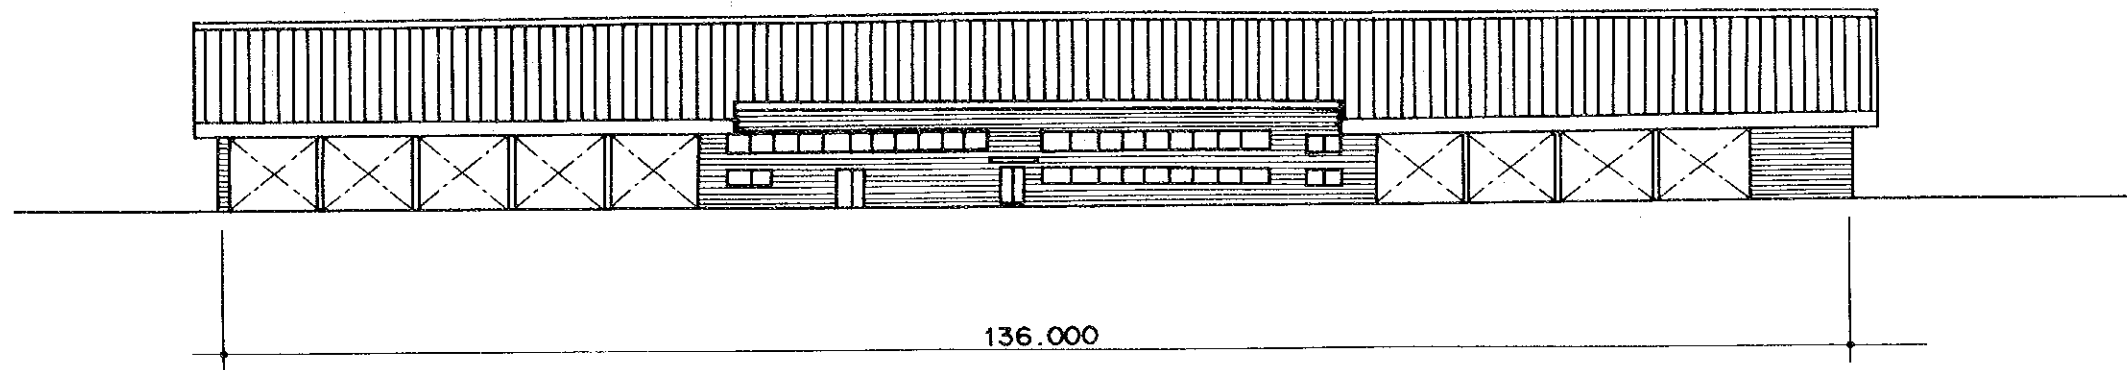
Cargo Terminal Building, Layout Plan
